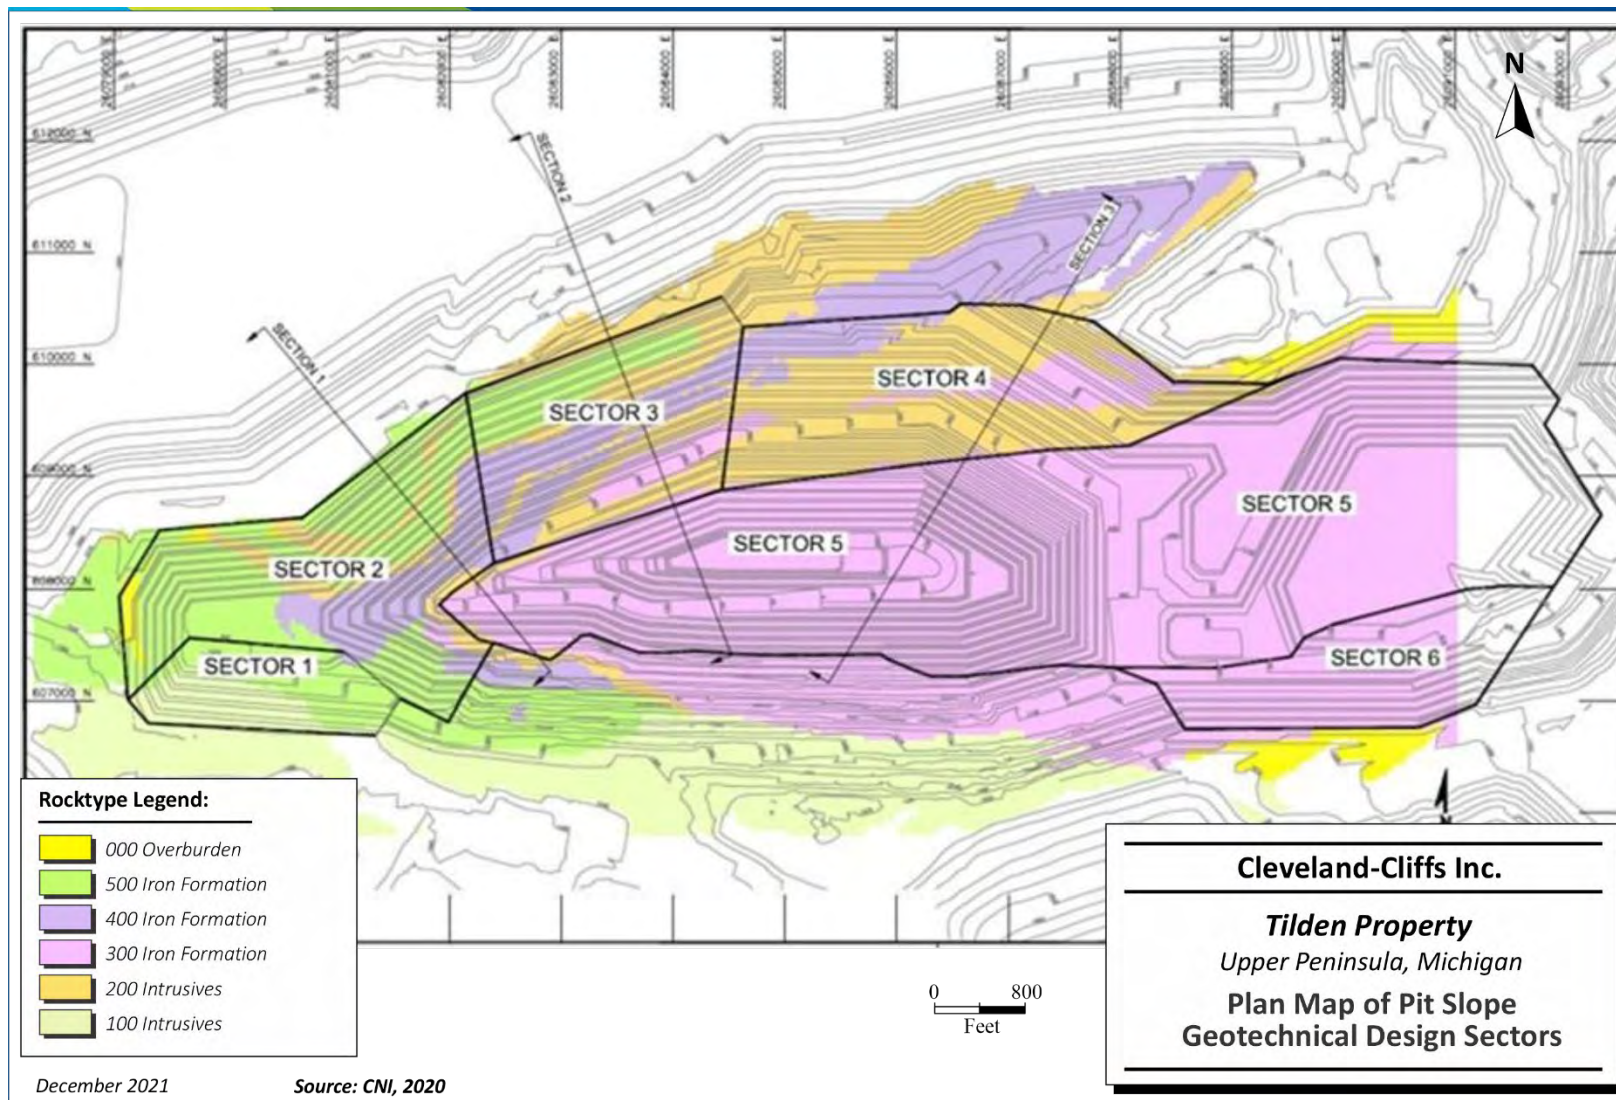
Plan Map of Pit Slope Geotechnical Design Sectors
